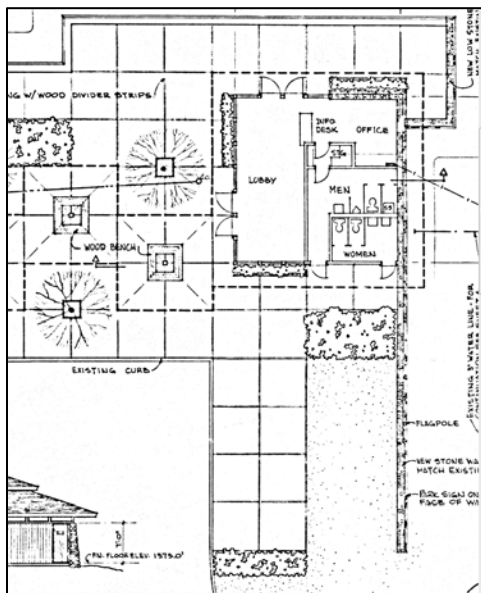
Visitor Center Floor Plan, as constructed in 1965. Image 12: Visitor Center floor plan, as it exists today.
